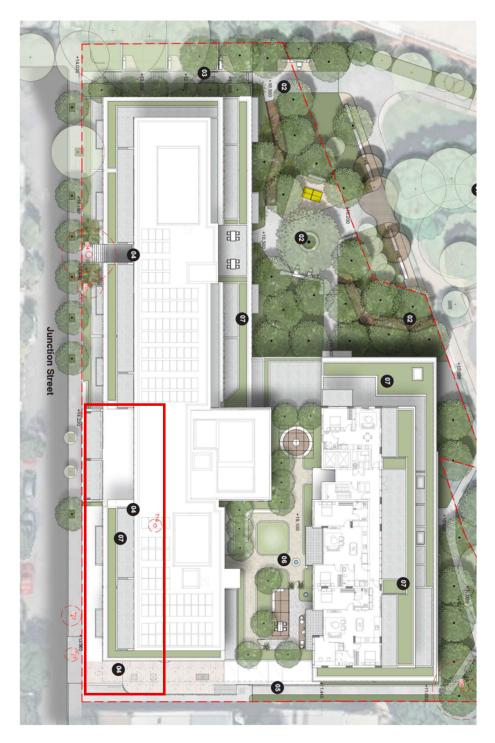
Excerpt from Landscape Master Plan showing virtual no greening on Junction Street from the Heritage Building to Kimber Lane – area outlined in red.
